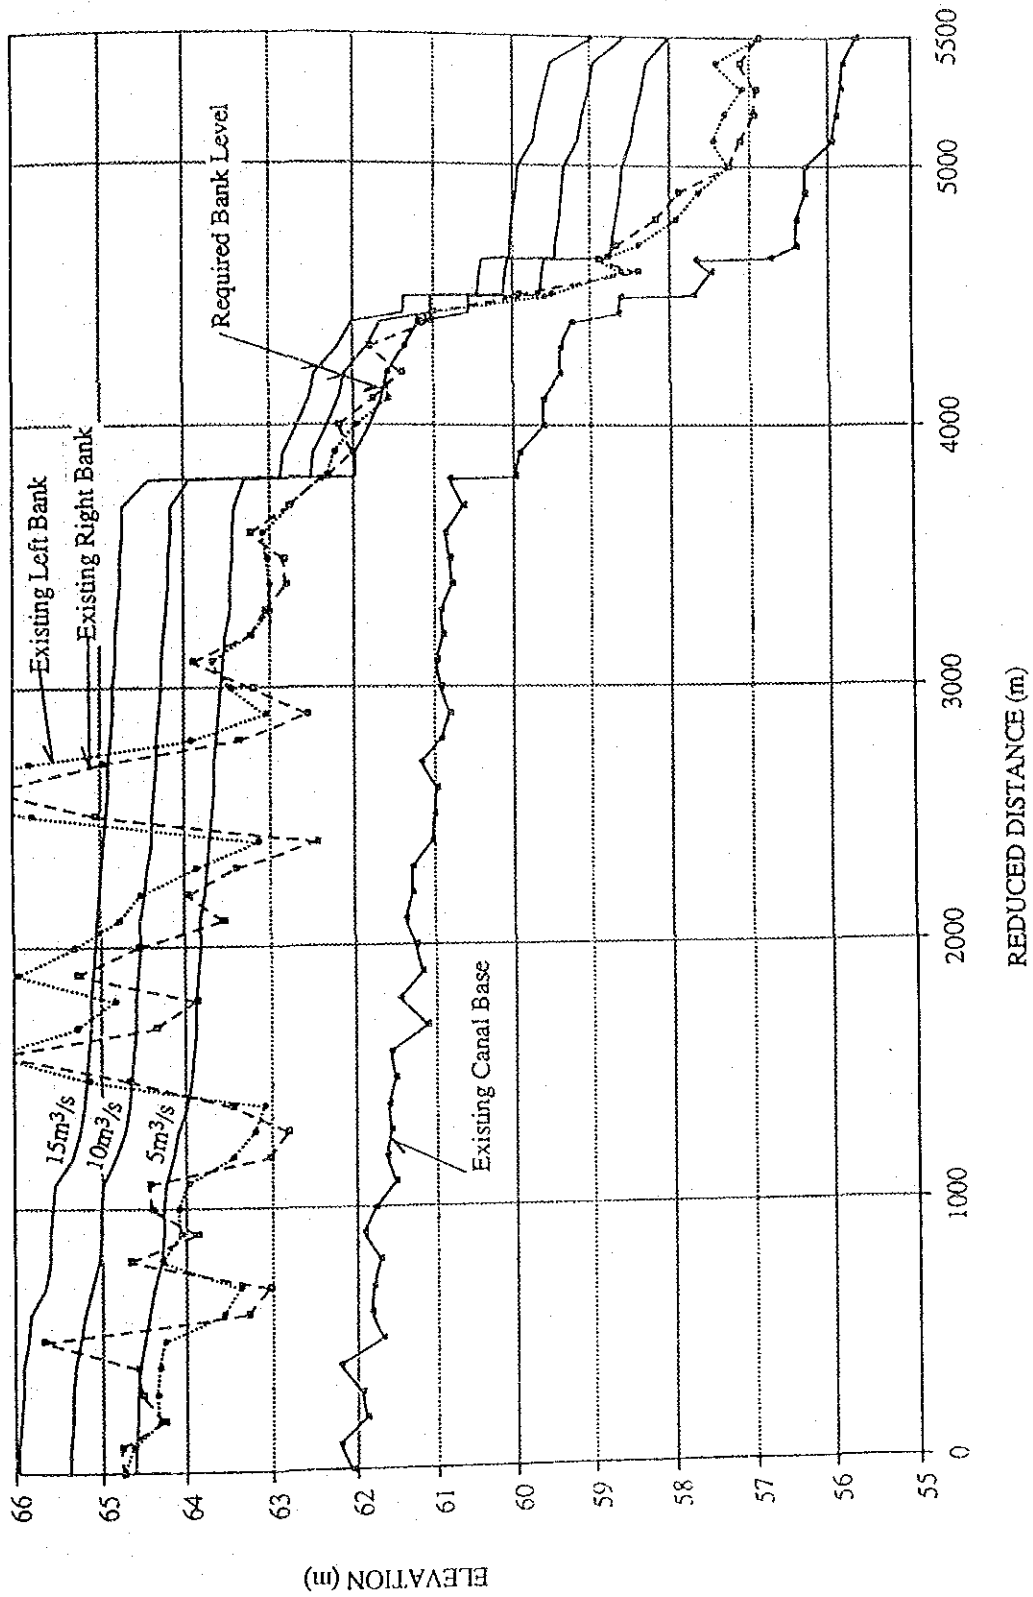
BANK LEVEL PROFILE OF BEDDEWEWA BRANCH CANAL
